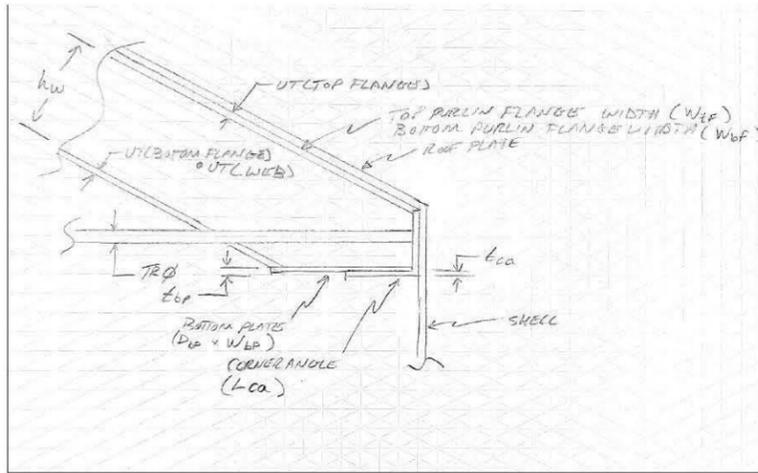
Example sketch roof purlin to roof and shell connection – new sketch to be produced if missing dimensions/structural elements are observed at site. Dimensions and UT locations identified.
